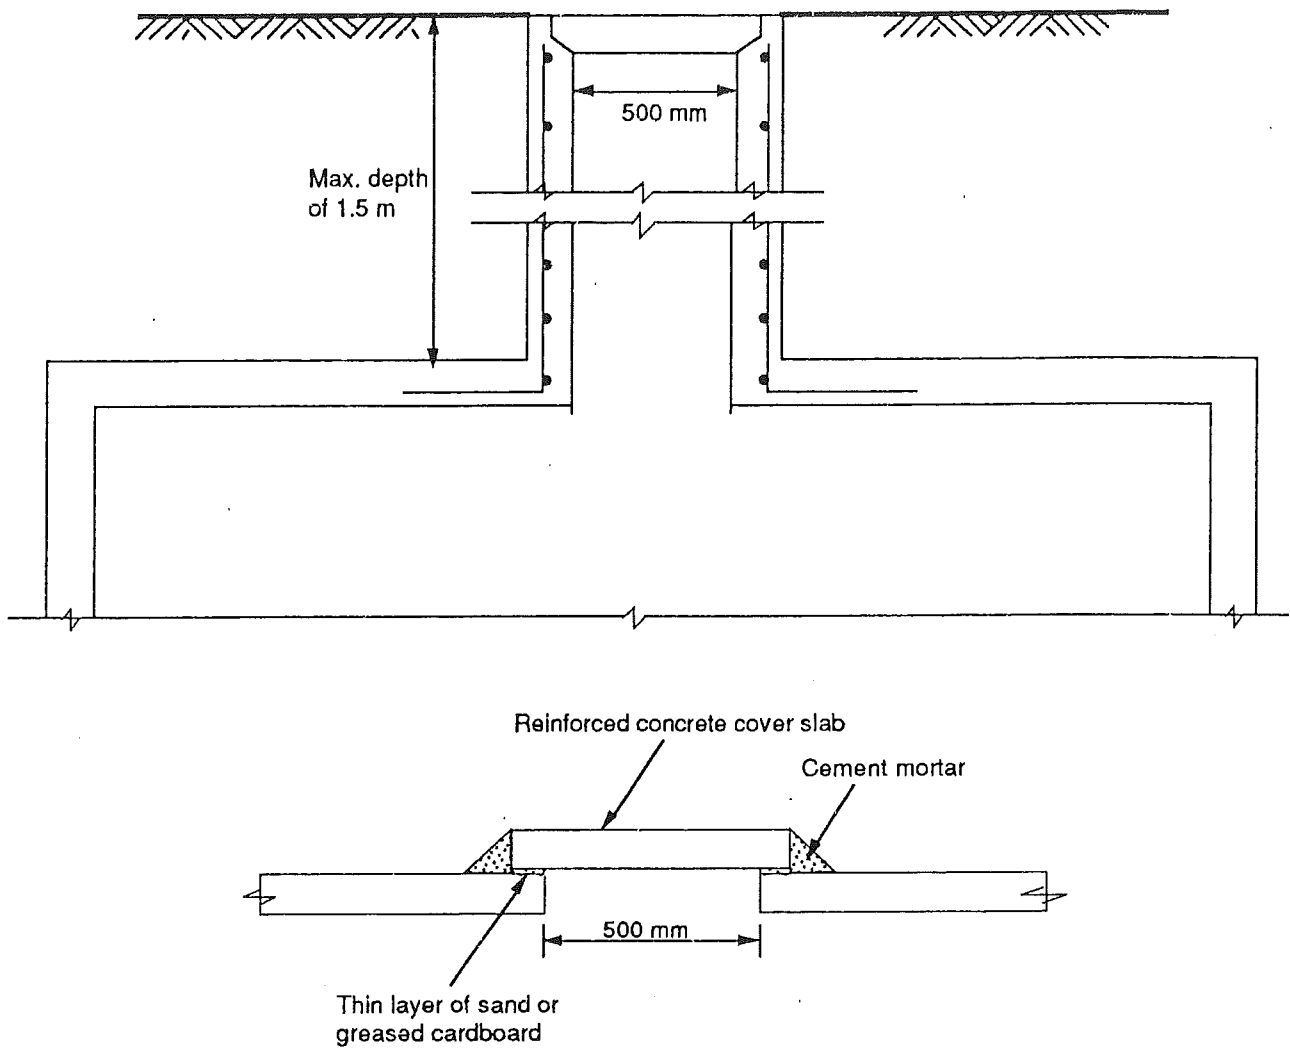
C TWO ALTERNATIVE METHODS OF PROVIDING MANHOLE COVERS
